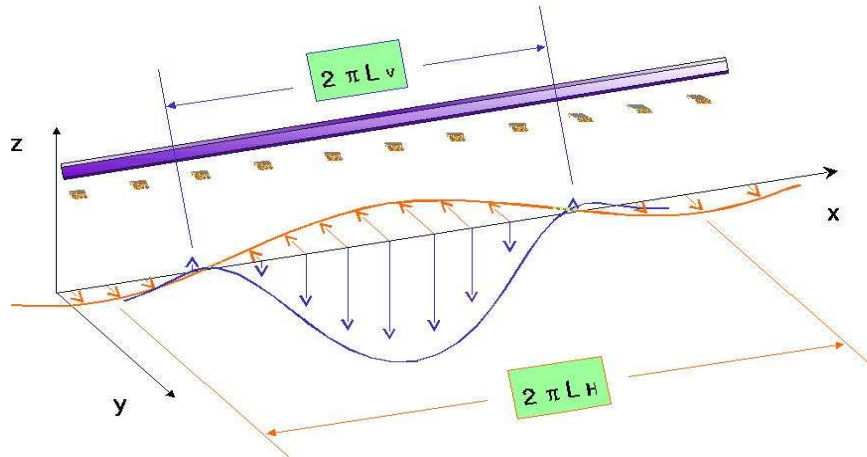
Left: Description of the rail and the multi-layered railway structure as a Bernoulli beam on a Winkler foundation.
